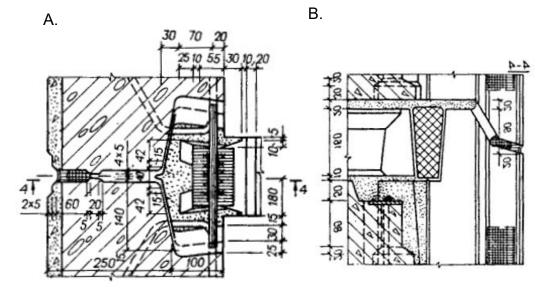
Shear key joint A. in plan; B. cross-section (15, p. 24)
